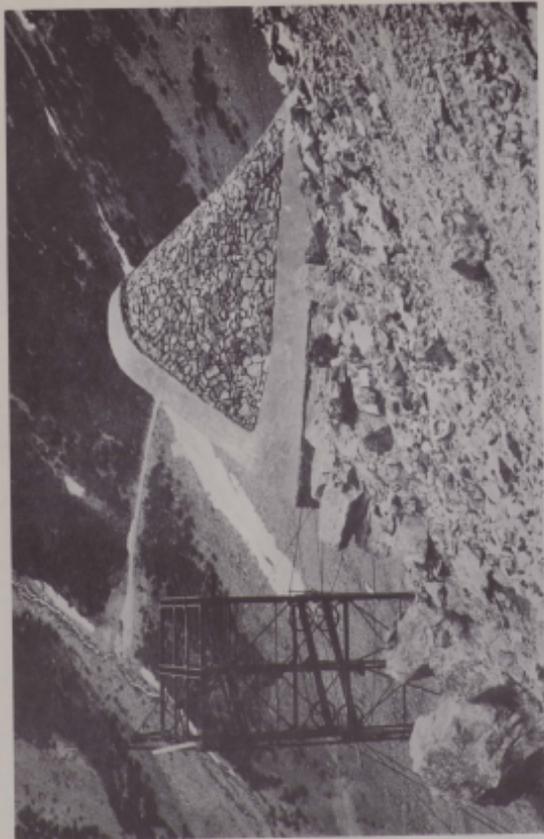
Avalanche defense structures in Arastra Gulch protecting Mayflower tramway. Stone masonry built in 1938. Earlier structures were log cribs filled with stones. The triangular shape of the structure was introduced to cause the avalanches to split and flow around the tower located just downslope of the wedge. (R. Armstrong photo)
